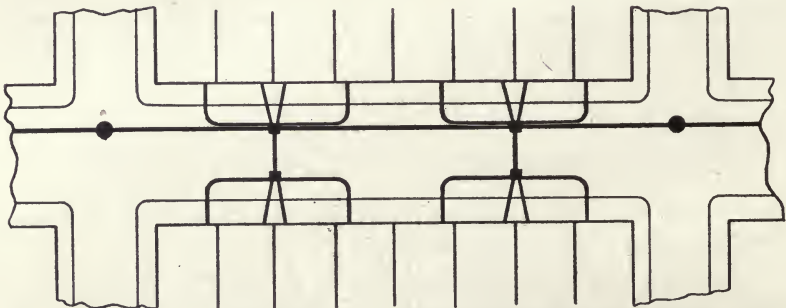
Service handholes and laterals, single-conduit system with crossings.
